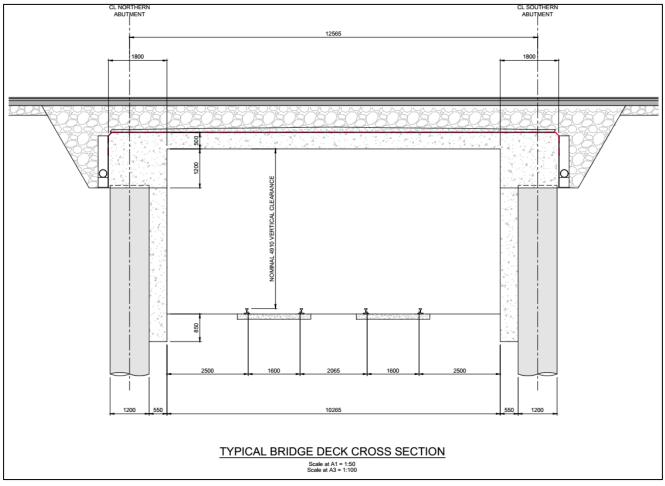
New South Circular Road Bridge (OBC1A) Cross Section (Southbound Lane)
